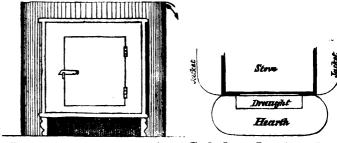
ELEVATION OF FRONT PART OF STOVE, Fig. 5.—PLAN OF FRONT PART OF STOVE, SHOWING FITTING OF JACKST.
